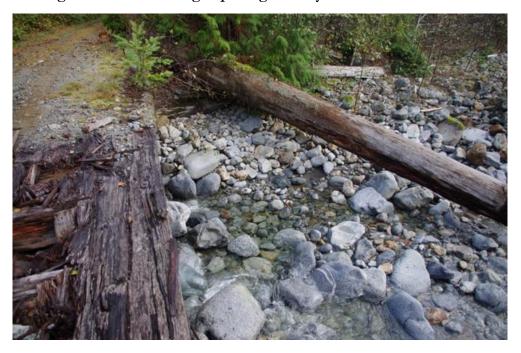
Downstream RR bridge abutment where channel is scouring around abutment possibly due to large boulders and a log on RL forcing flows to RR. Deepest pools in the reach are formed by scour at base of bridge abutments.
